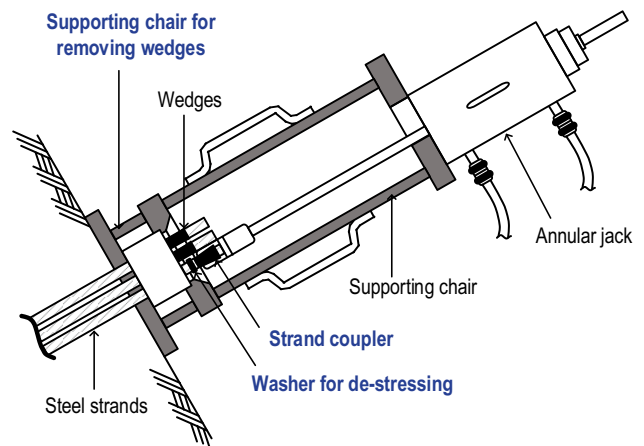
Device layouts for the destressing and restressing of existing anchors with a short exposed length (modified from JAA (2008))
